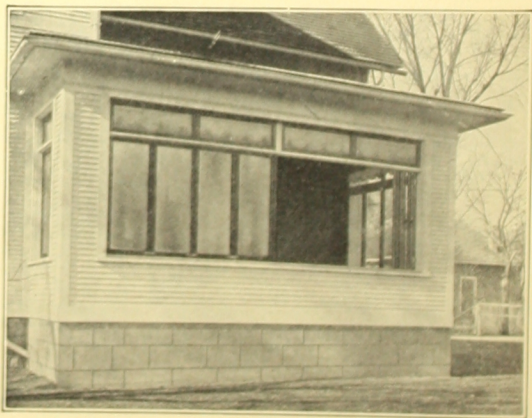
Exterior of sun parlor shown in Figures 5, 9, and 11. Sash in right half of front window wide open. All other sash in closed position.
